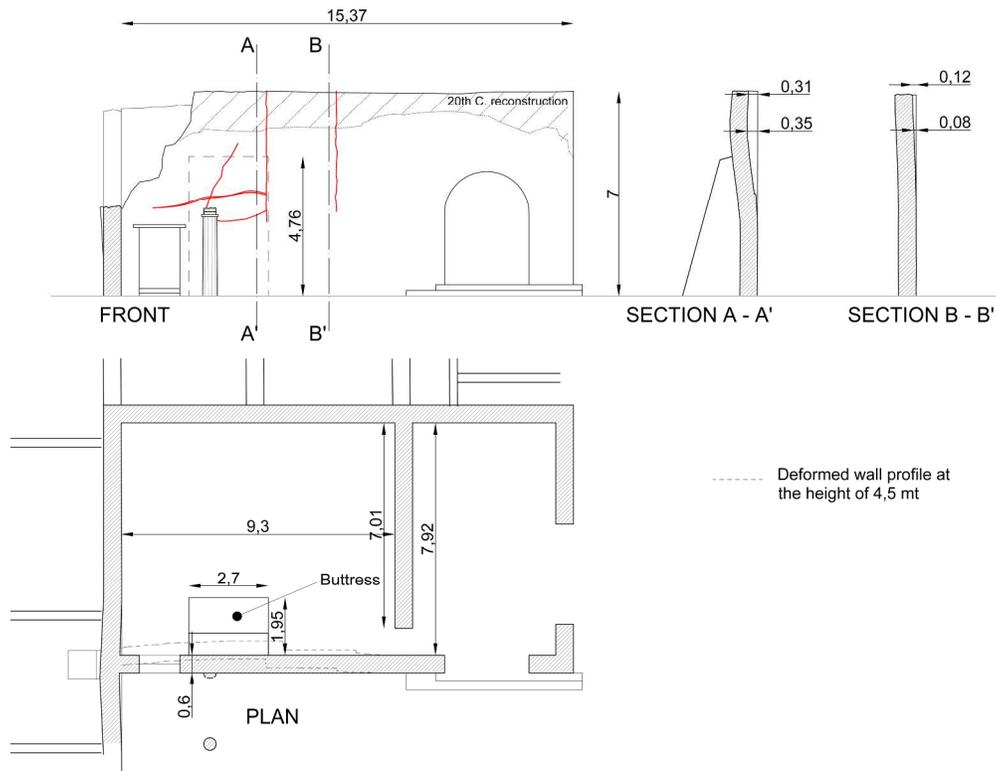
The destrictarium block. Relief of the two rooms plan, elevation and cross sections of the masonry wall facing palaestra
